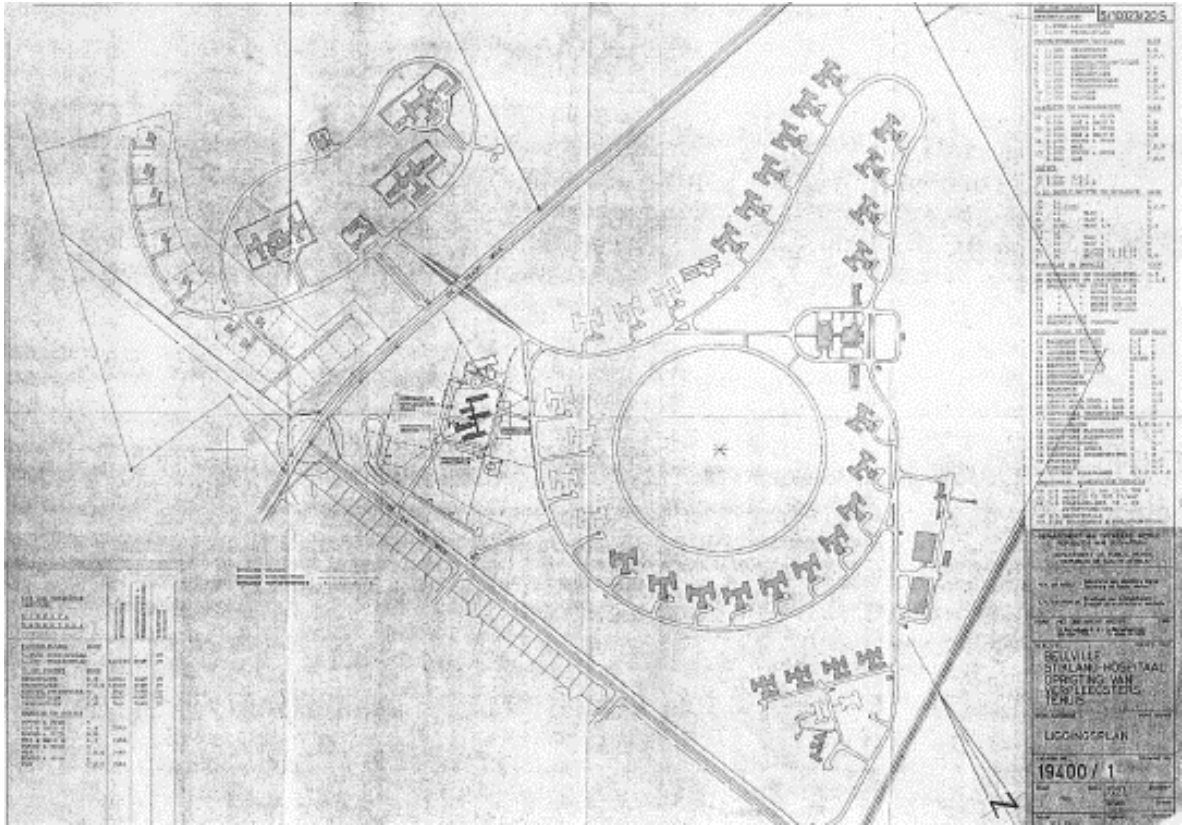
Original Stikland Mental Hospital site plan (In Louw 2019)
